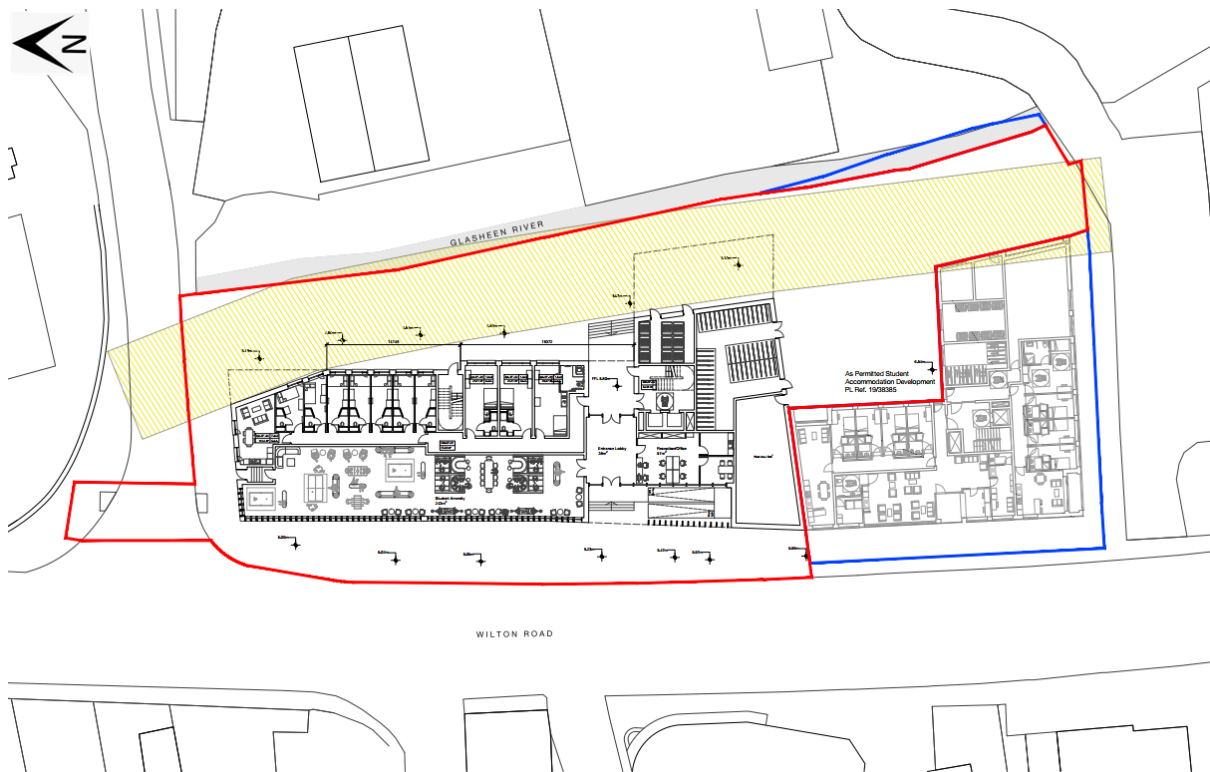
Proposed Development Site Layout- Typical Ground Floor Plan. (Butler\Cammoranesi)
